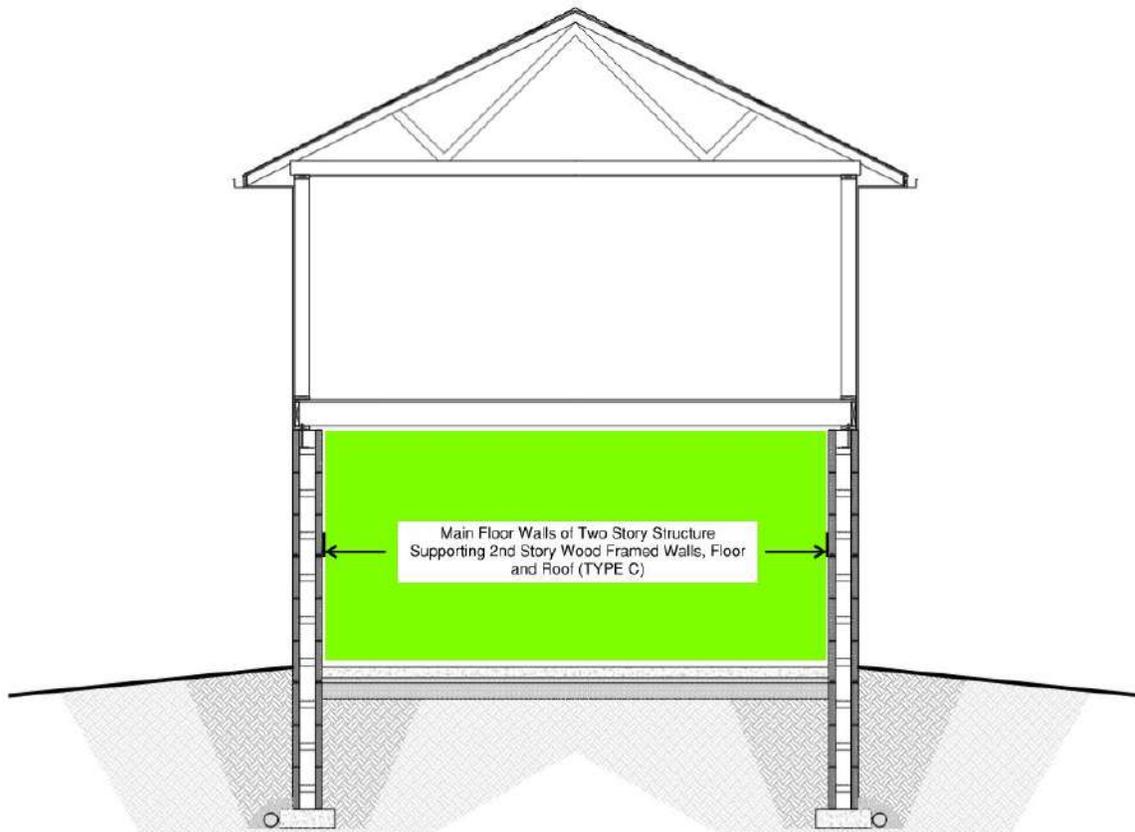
Wall Configurations in a Building Without Walkout Basement
